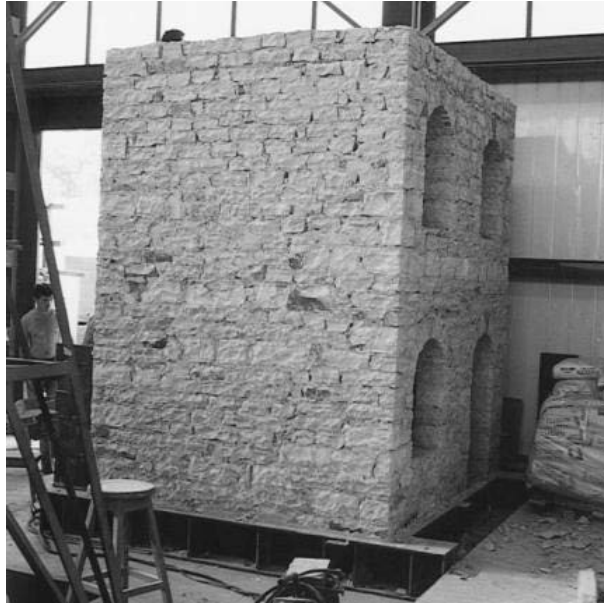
A stone masonry building model (Benedetti, Carydis & Pezzoli 1998)
